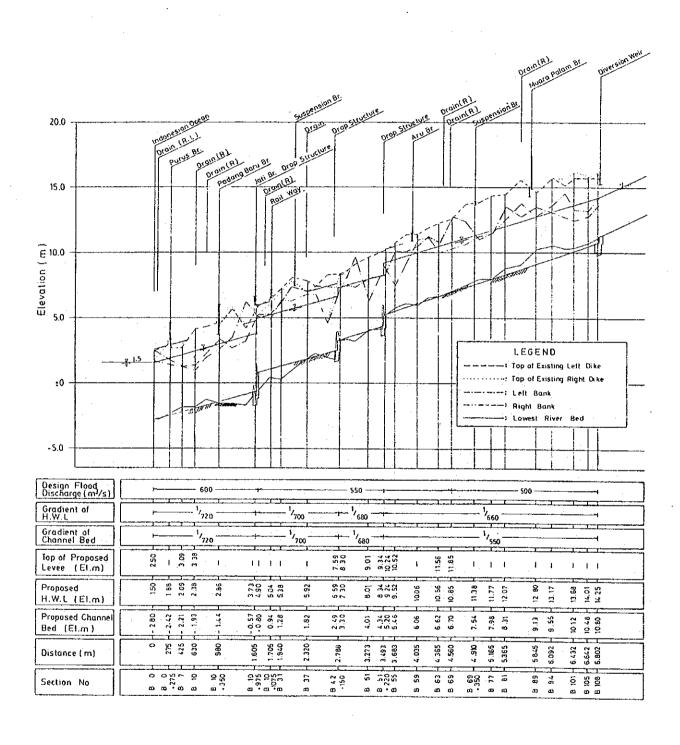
(3) Proposed Profile of the Jirak River for Comprehensive Plan
